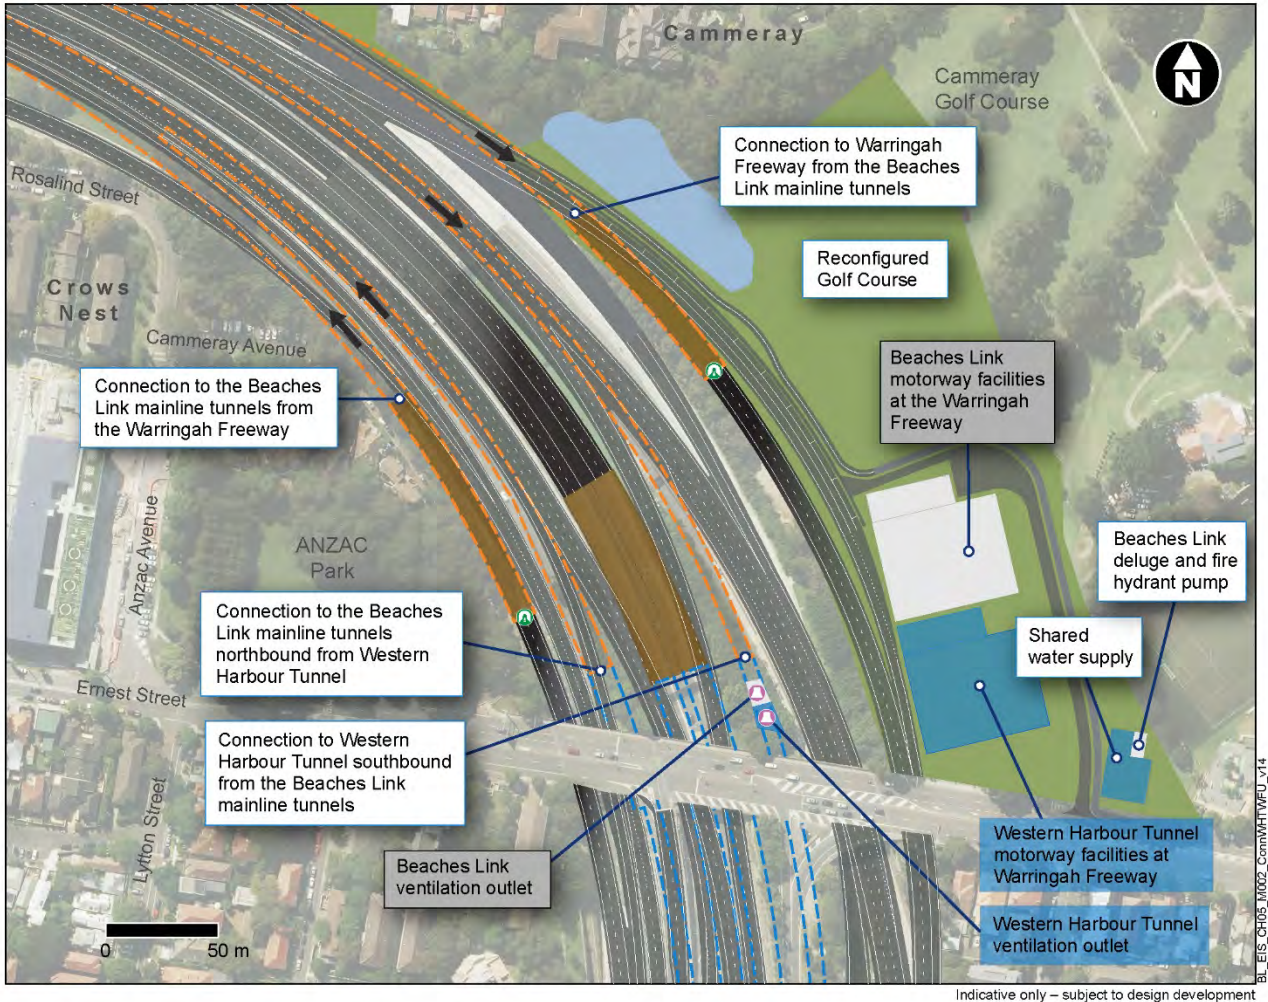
Indicative tunnel-to-tunnel connections to the Western Harbour Tunnel and Warringah Freeway Upgrade project tunnel
